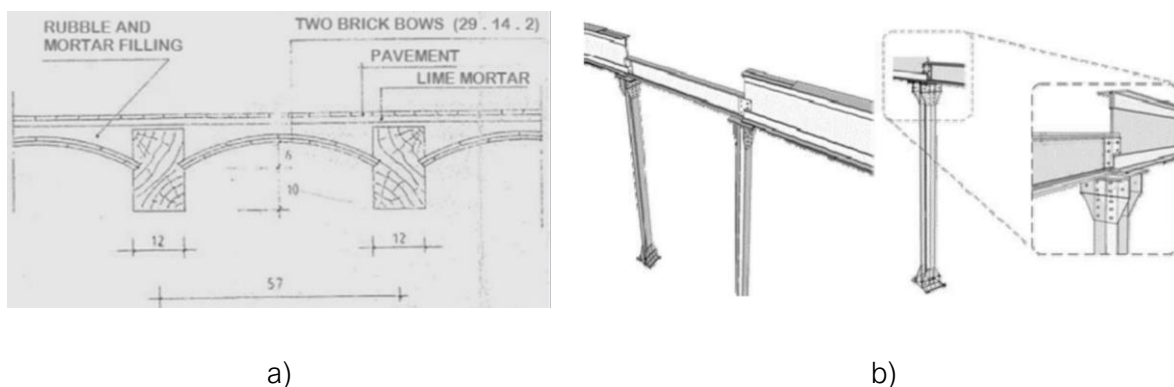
Structural elements of the *Eixample* buildings: a) Typical one-way floor with timber beams (Pujades et al., 2012); b) Metallic girders and cast-iron pillars at the ground floor of the building (Gonzalez-Drigo et al., 2015).
